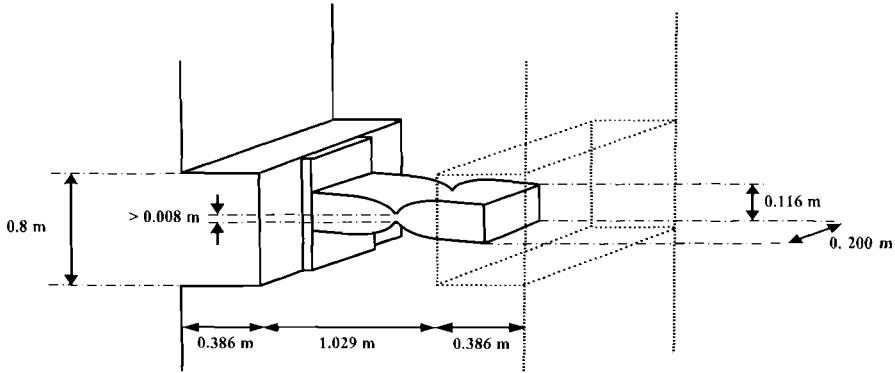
Geometry of a Damper for Example 11.5, and of its Connection to the Walls
